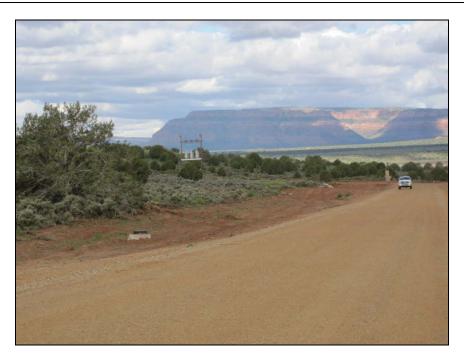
Sanitary Sewer on Kaneplex Road at Proposed Pilot Plant Site (recently installed to serve Public Safety Facility)
